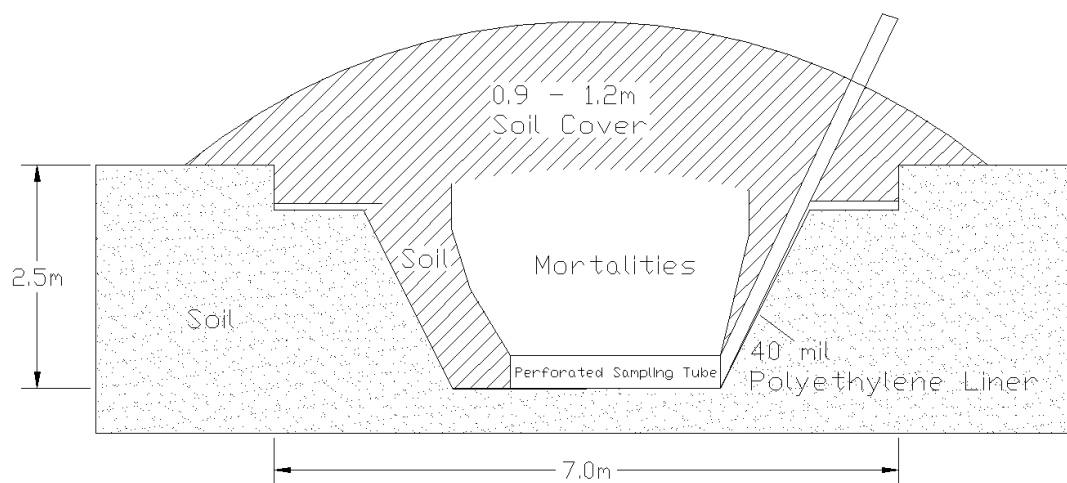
Burial pit cross section with soil cover and no top liner.
